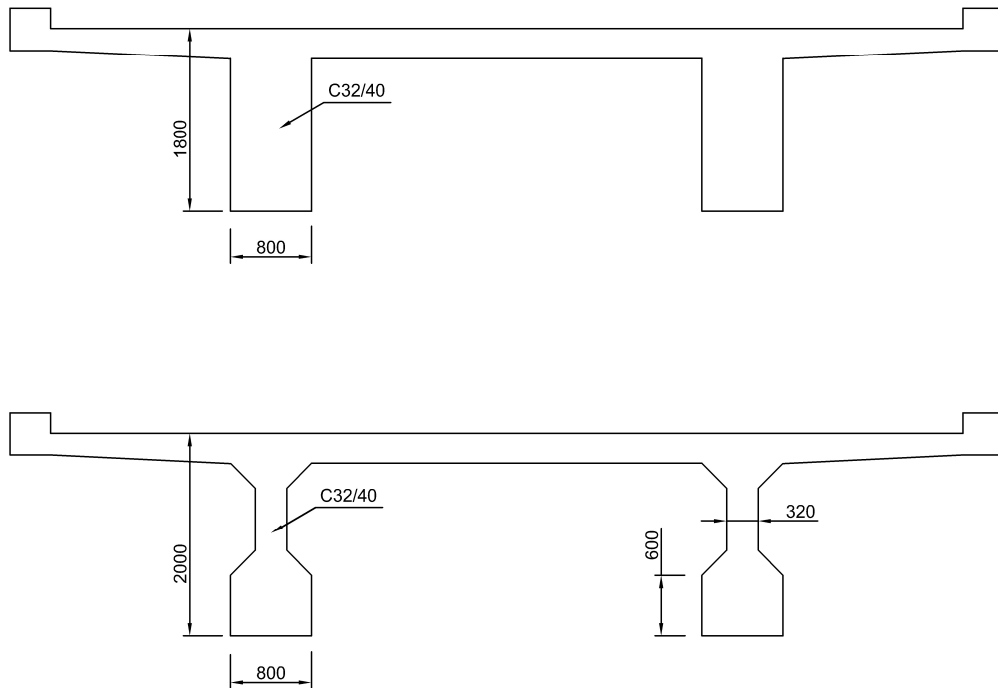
Geometry of the bridge cross-section alternative of each girder shape that have the lowest total cost. Measurements are presented in mm.
